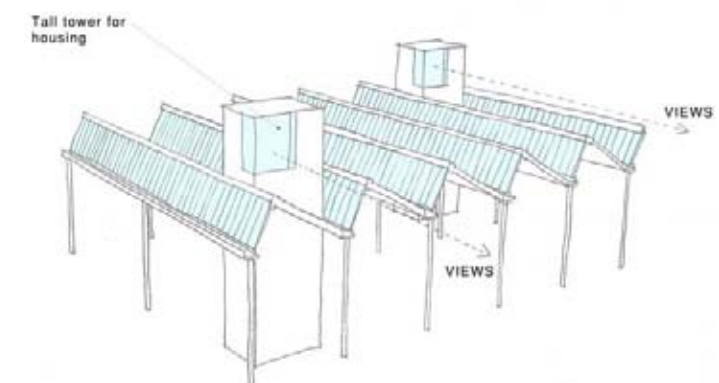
New build tower pods that sit over the roof. Potential for elevated views over and out of the sheds.
